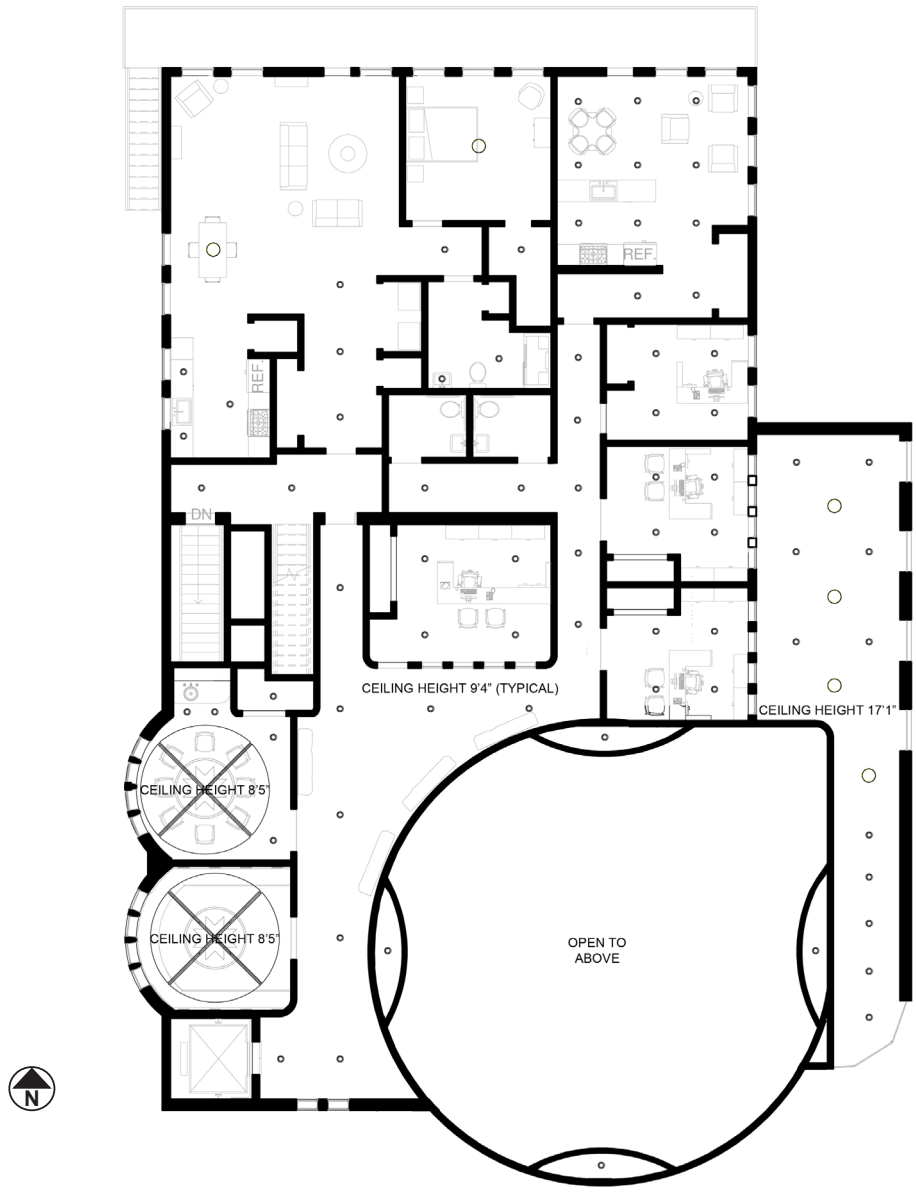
Basement Reflected Ceiling Plan. Not to scale.
